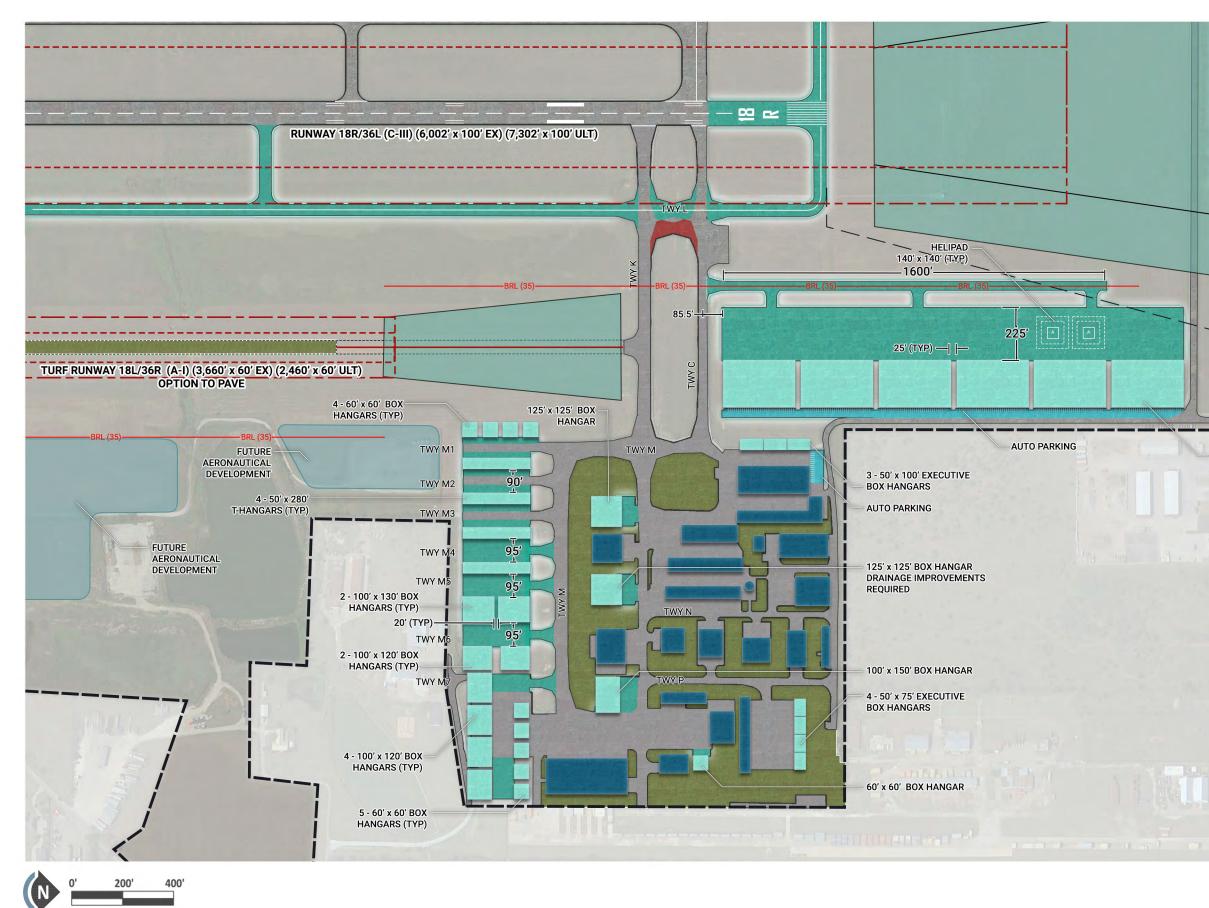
RECOMMENDED PLAN (LANDSIDE - WEST)
